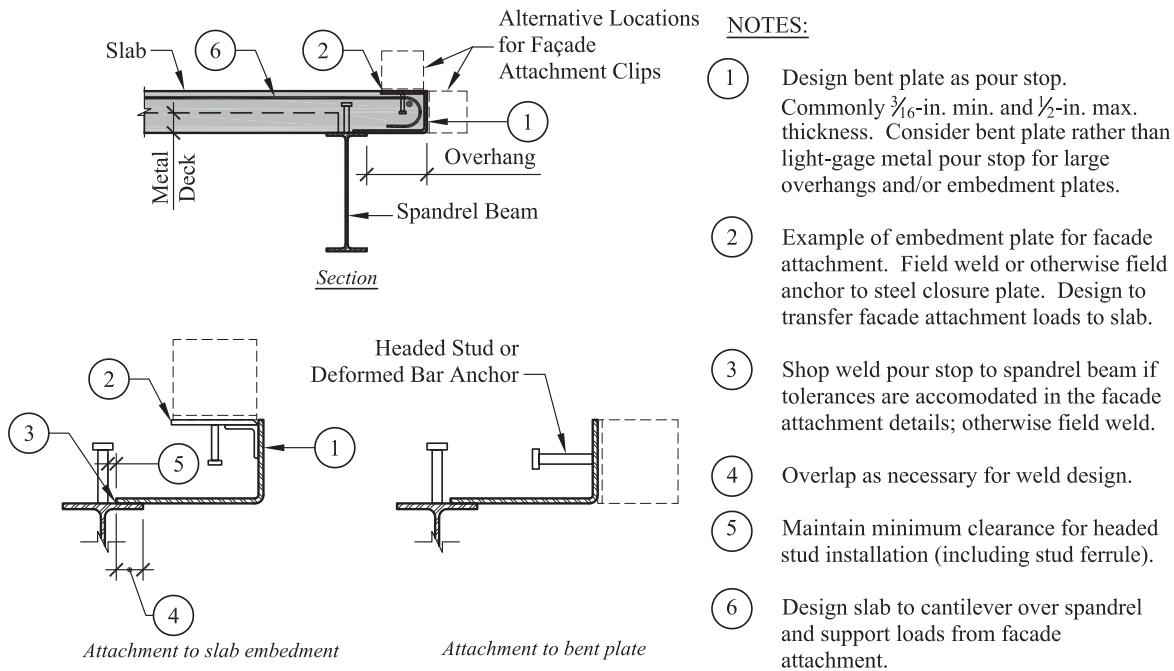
Typical detail of steel edge member as pour stop and façade attachment.
